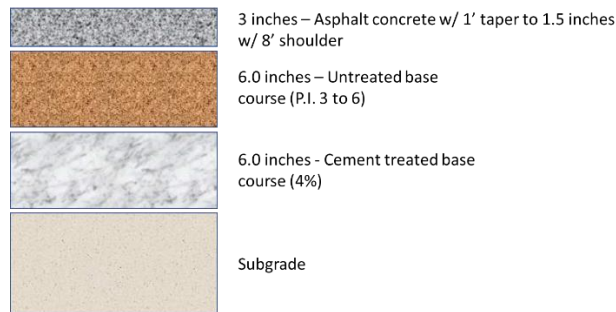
Section B inverted pavement from F-051-1(8) [Johnson 1961].
